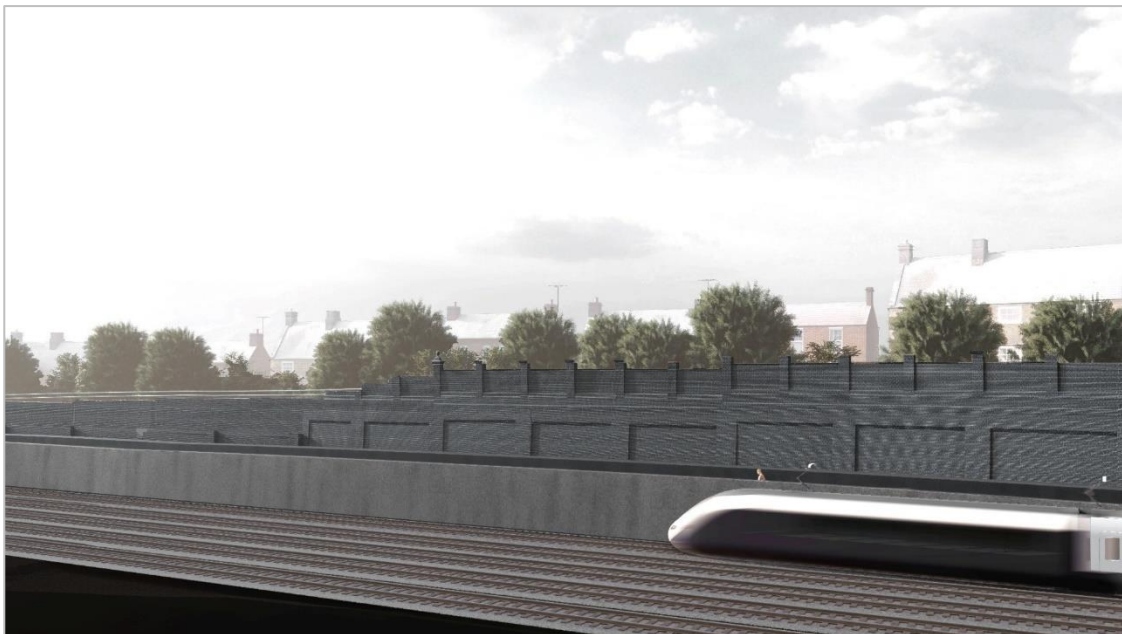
Artist's impression of the proposed PVE Berm, Wall and Upstand Support Structure in situ
